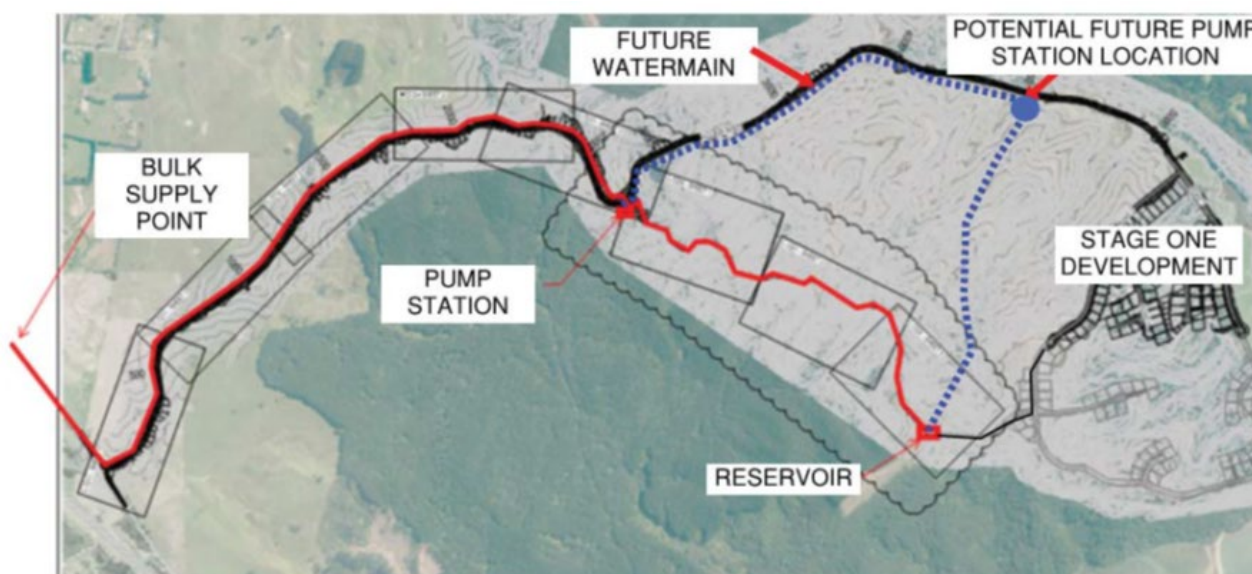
Proposed plan of Water Infrastructure (as per agreement)
